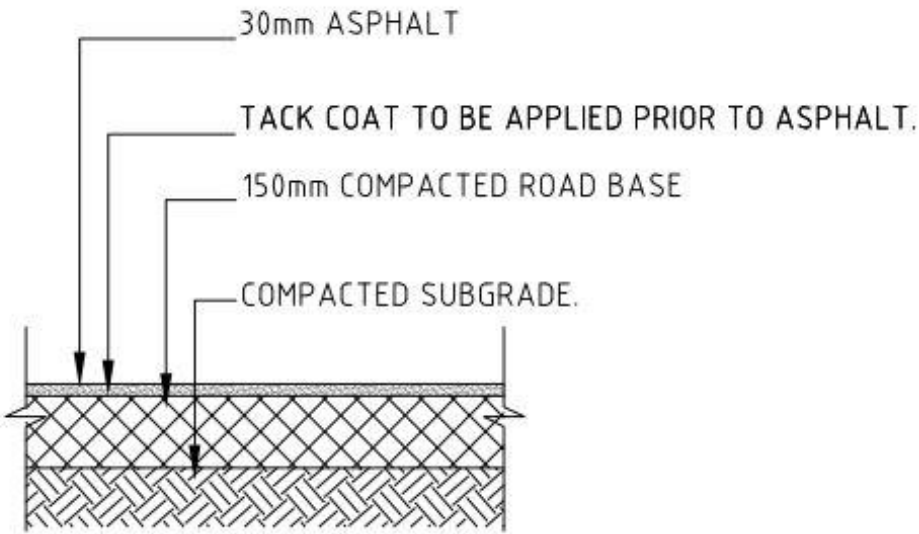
DETAILS OF INDIVIDUAL RIGHTS OF WAY
